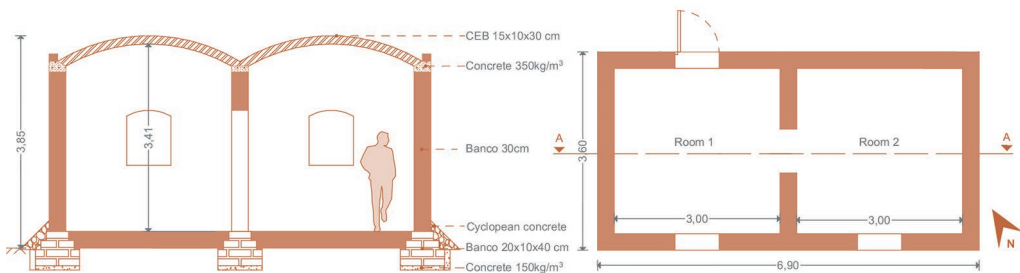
CISP Dwelling section and plan (adapted from Gualdrón-Frias, 2024).
